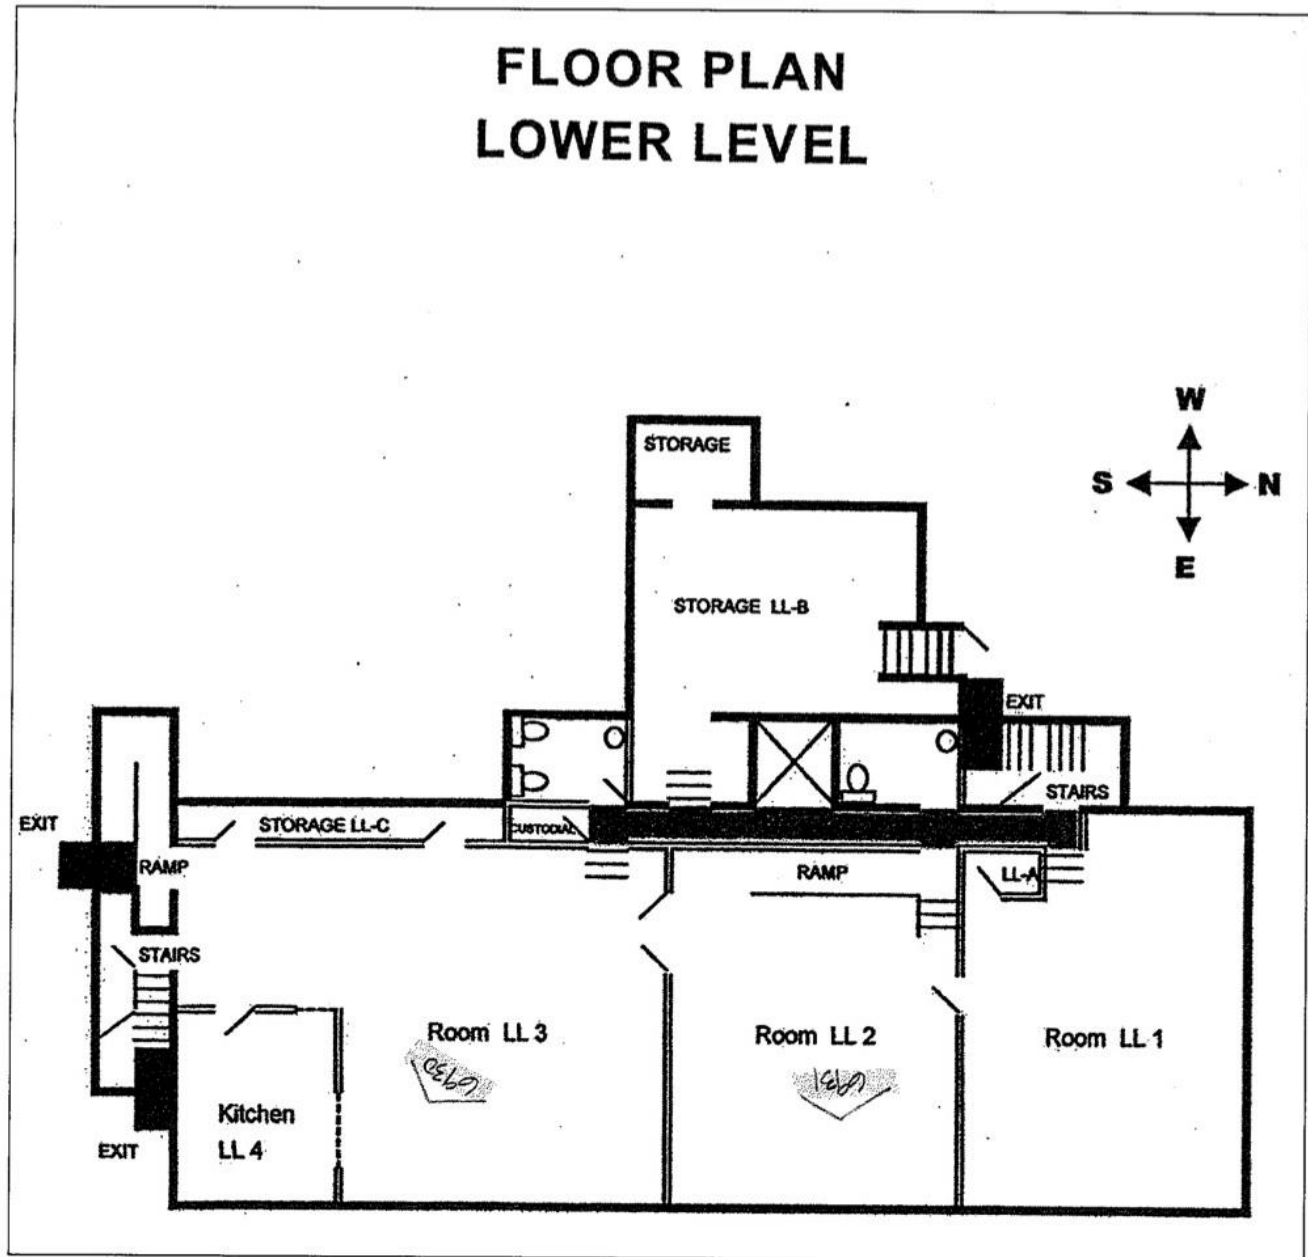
Lower Level Floor Plan – City of Eau Claire, 2010.
